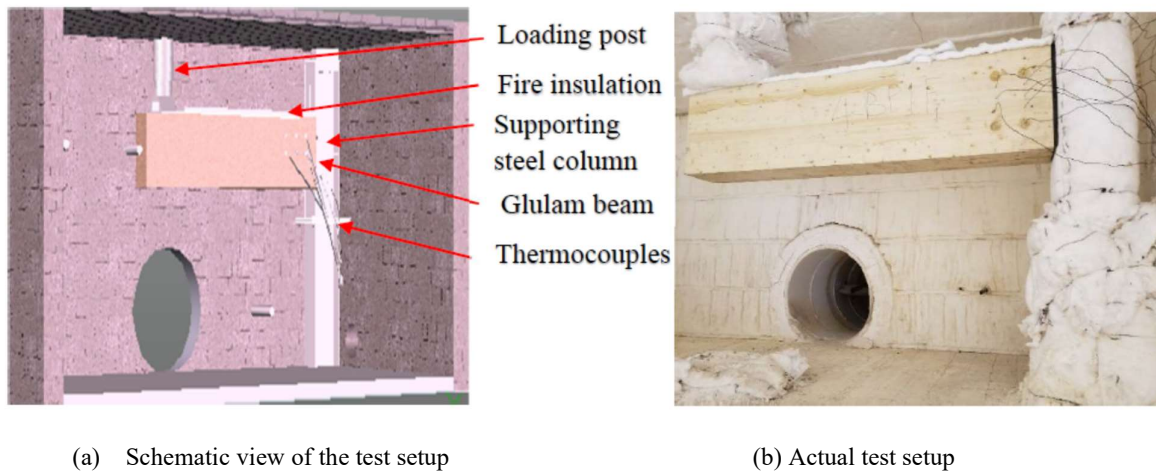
Test setup of the specimen with the connection of the first pattern of bolts (P1) installed inside the furnace.
